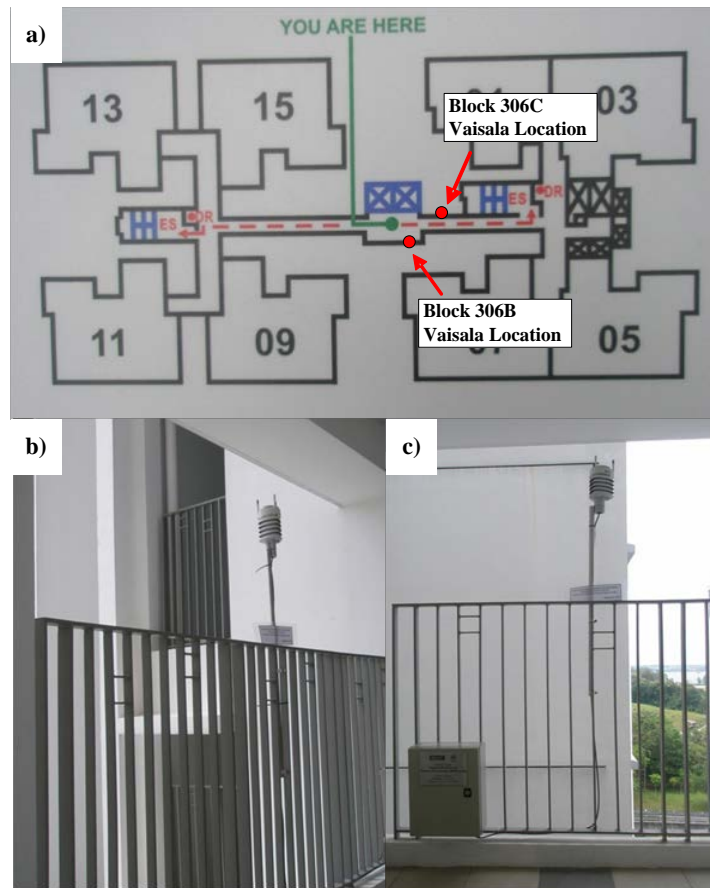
a) Floor plan of Block 306C and Block 306B; b) The Vaisala installed at the Block 306C corridor opening; and c) The Vaisala installed at the Block 306B corridor opening.
